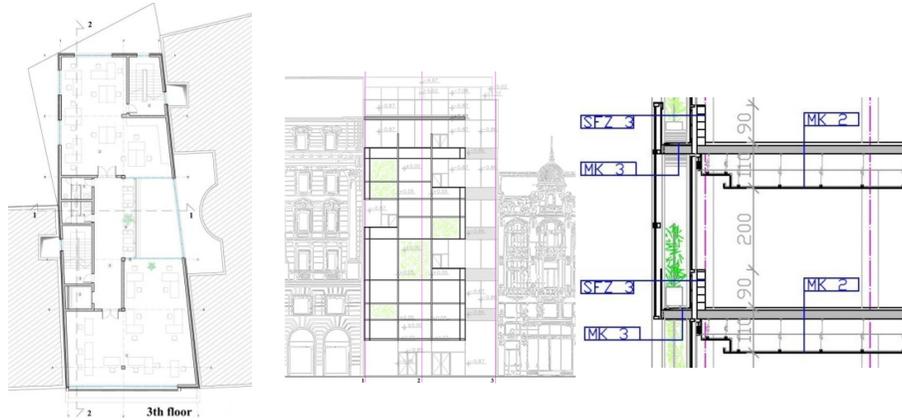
Plan of a typical floor, elevation and cross-section of the street facade of Model 2
